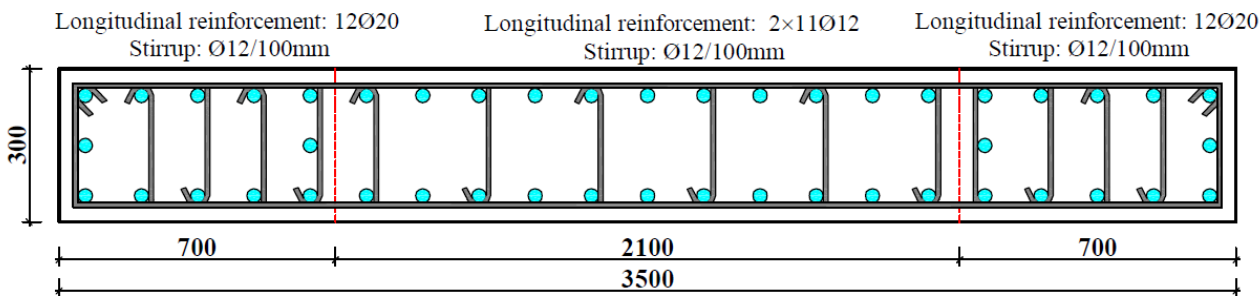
The sectional geometry and reinforcement appearance of reinforced concrete shear walls
